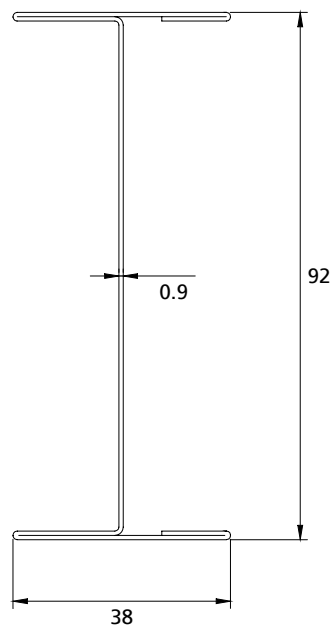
Cross-sectional view of a Gypframe 92I90 'I' Stud.
